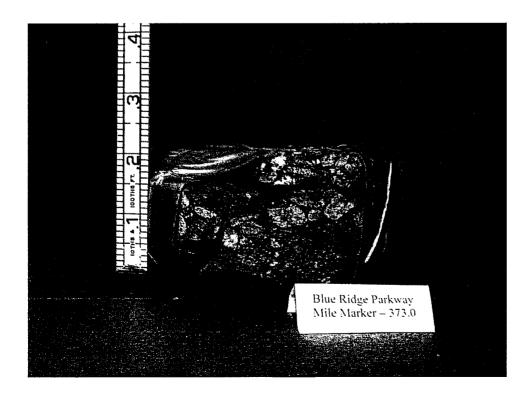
Additional Asphalt Cores Mile Marker 373.0
